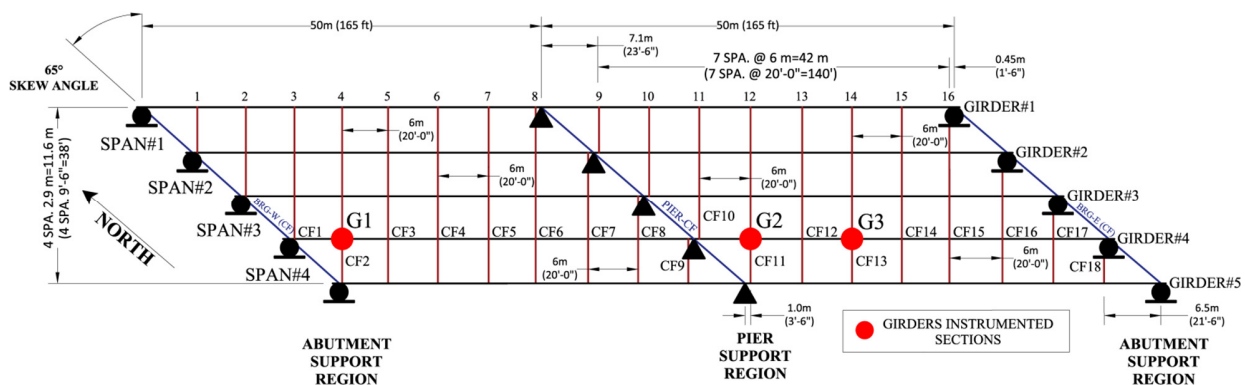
US13 Bridge framing plan and instrumentation locations.
